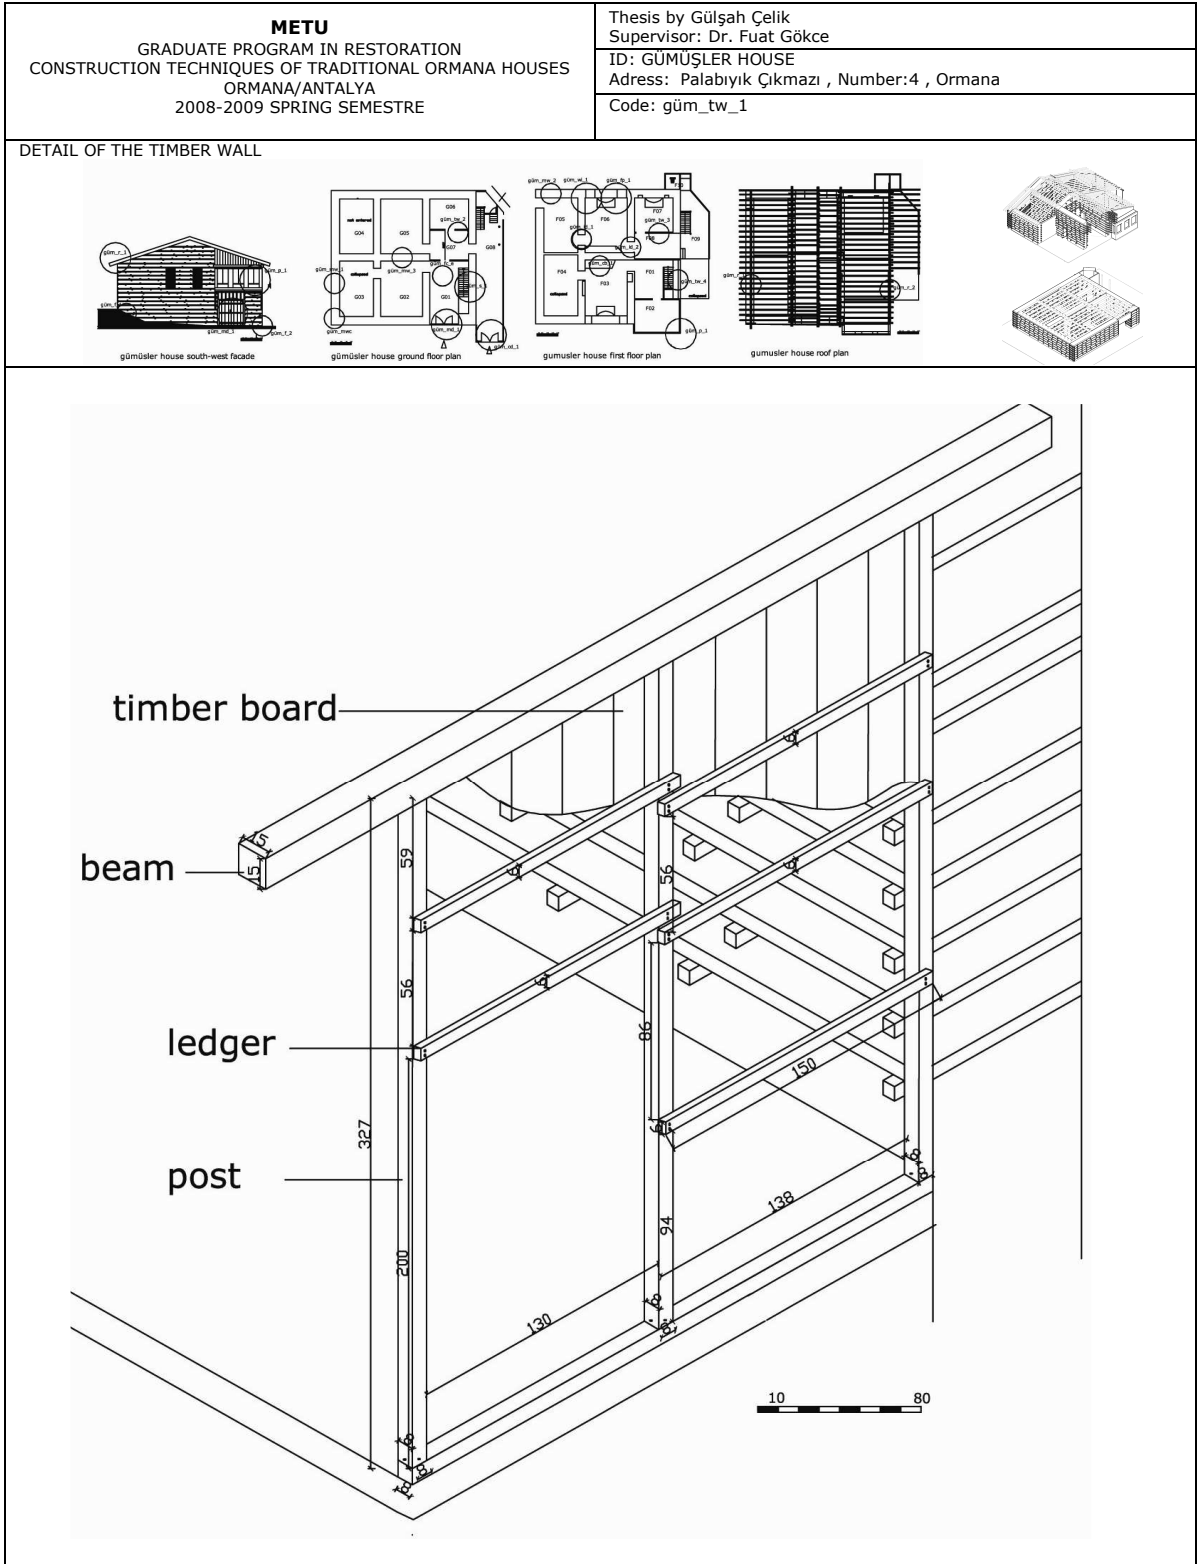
Record card of the detail of the timber wall of the Gümüşler House. Çelik, 2008.
